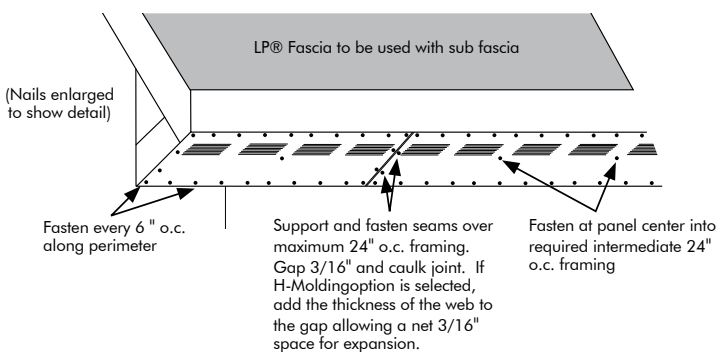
16 IN. + 24 IN. CUT TO WIDTH NAILING FRAMING DIAGRAM
